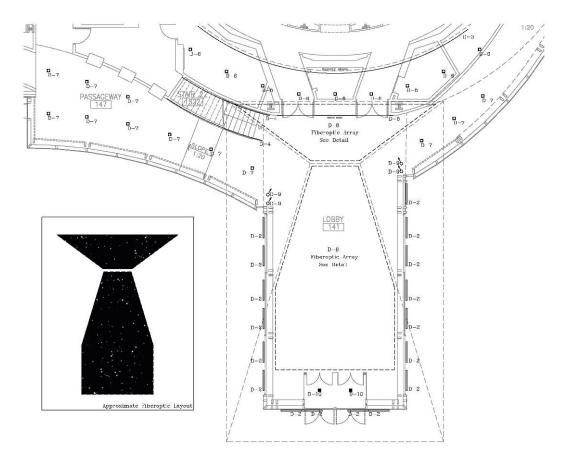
Reflected Ceiling Plan (New Layout)
